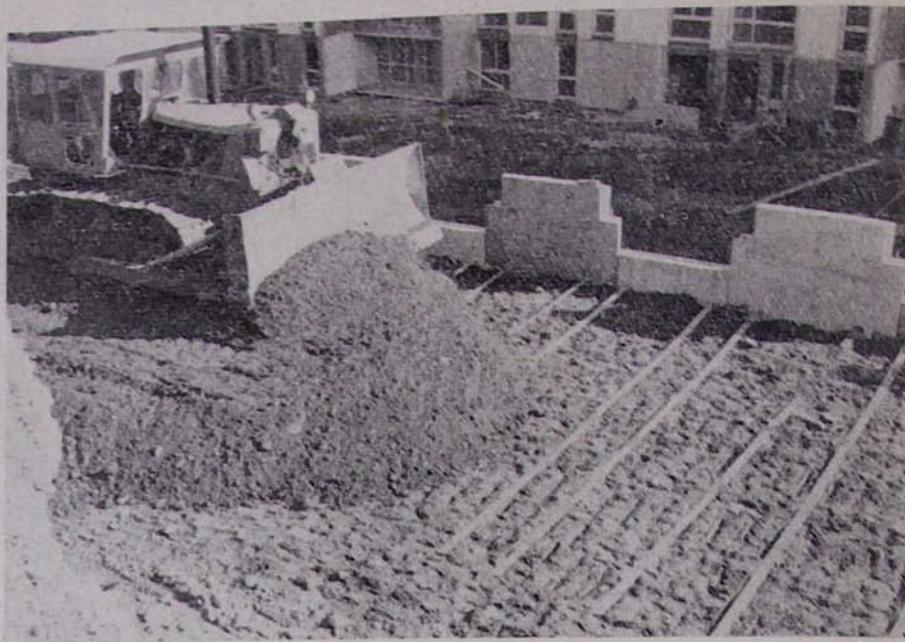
Construction of a Reinforced Earth fill. Precast skin, concrete scales, reinforcing strips secured to scales. Fill placement under way. Note that bulldozer is working at the edge of the fill.
